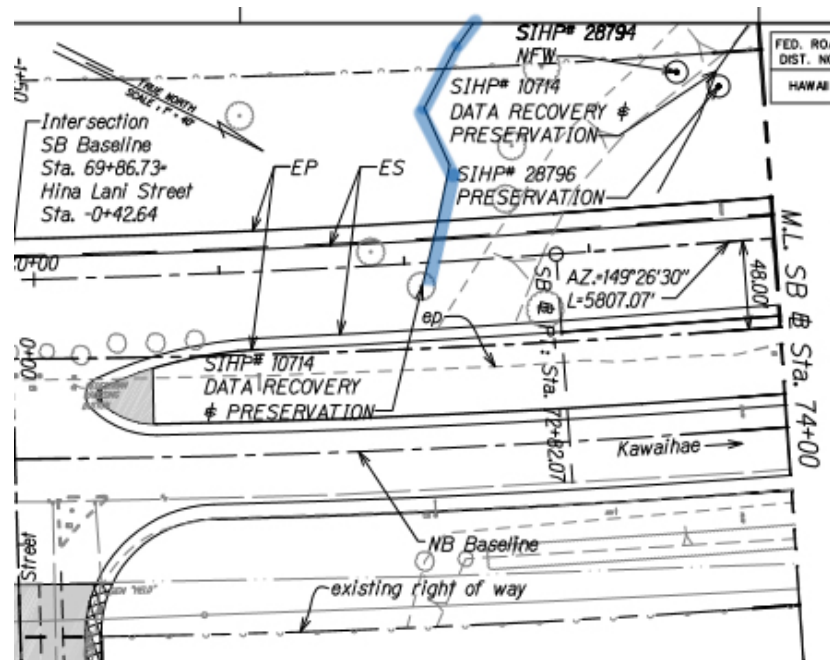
Road to Sea Trail (SIHP #10714, highlighted in blue) in Final Design Plans
